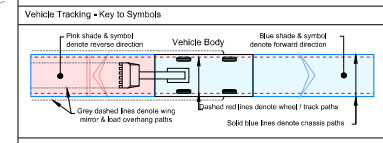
MMD-01-XX-DR-C-DRAFT
